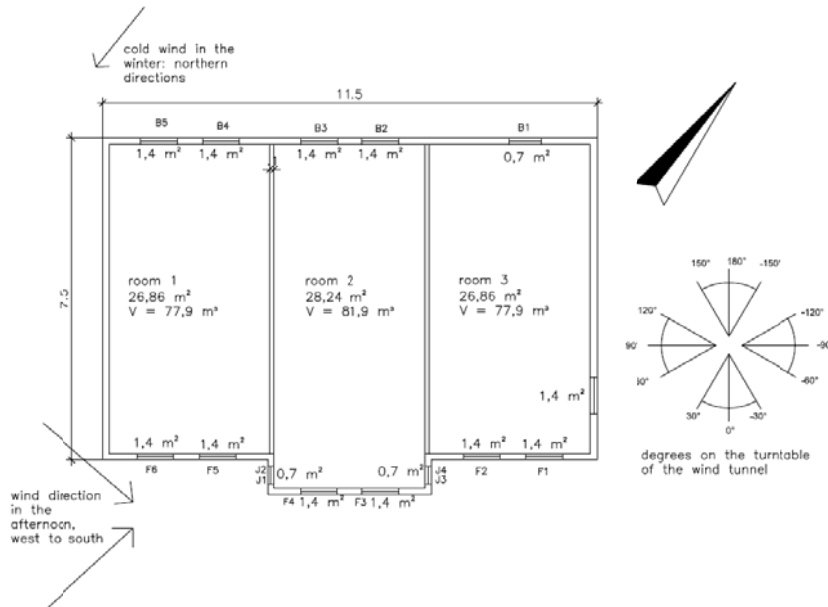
Floor plan 1st storey of the reference building in optimized orientation to prevailing wind
